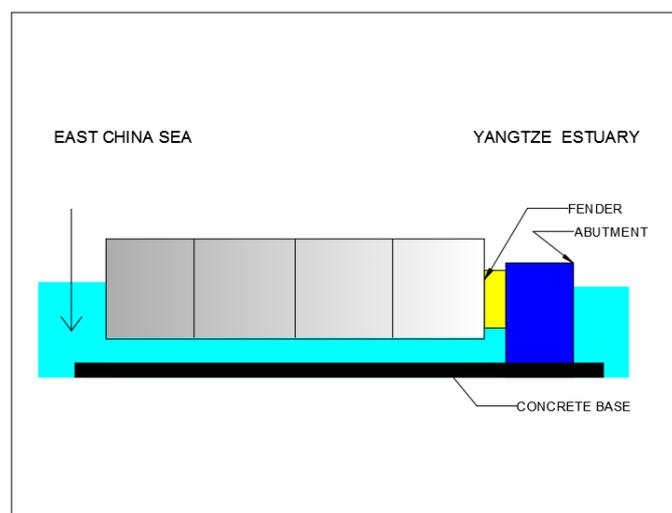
6. Gate during immersion, not to scale (cross section 3-3')
